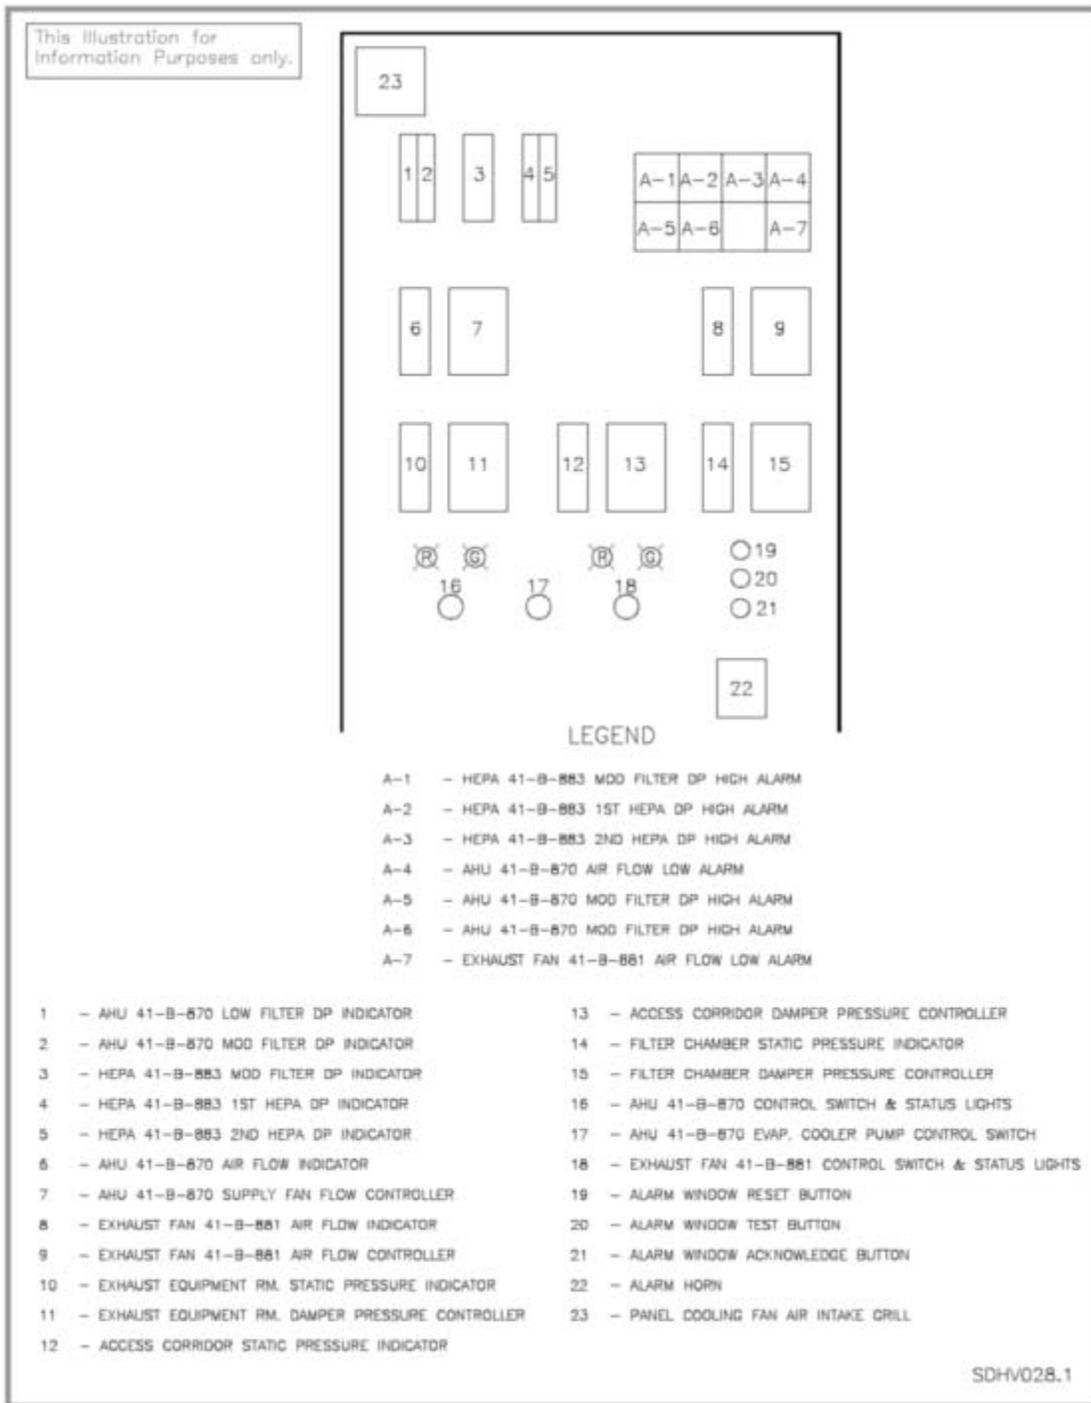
Exhaust Filter Building HVAC Panel 314-CP-067-02 Layout
